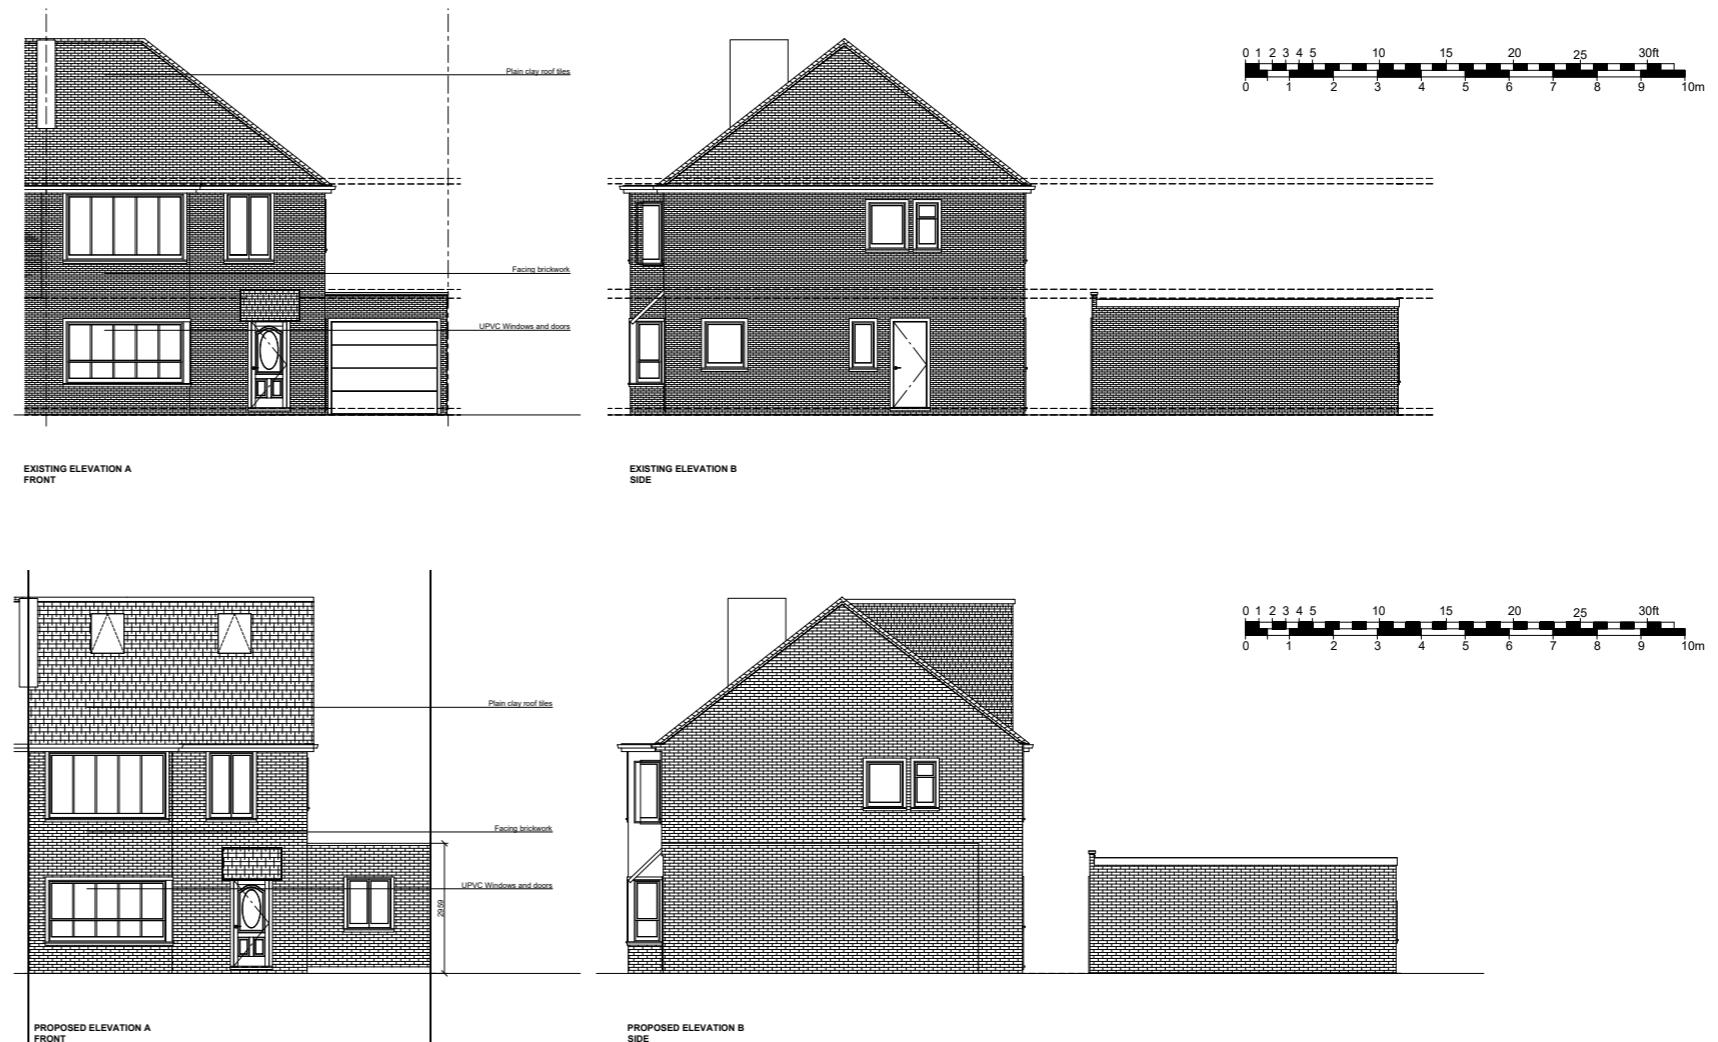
Approved Proposal (Ref. No. 76491/APP2022/3383)
